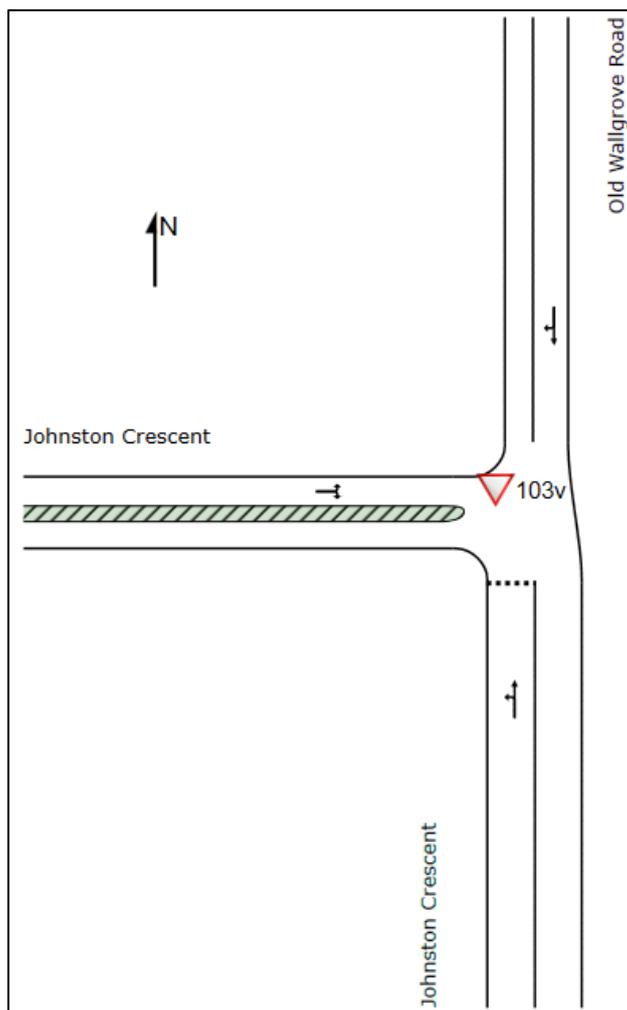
SIDRA Existing Intersection Layout – Old Wallgrove Rd / Johnston Cres
